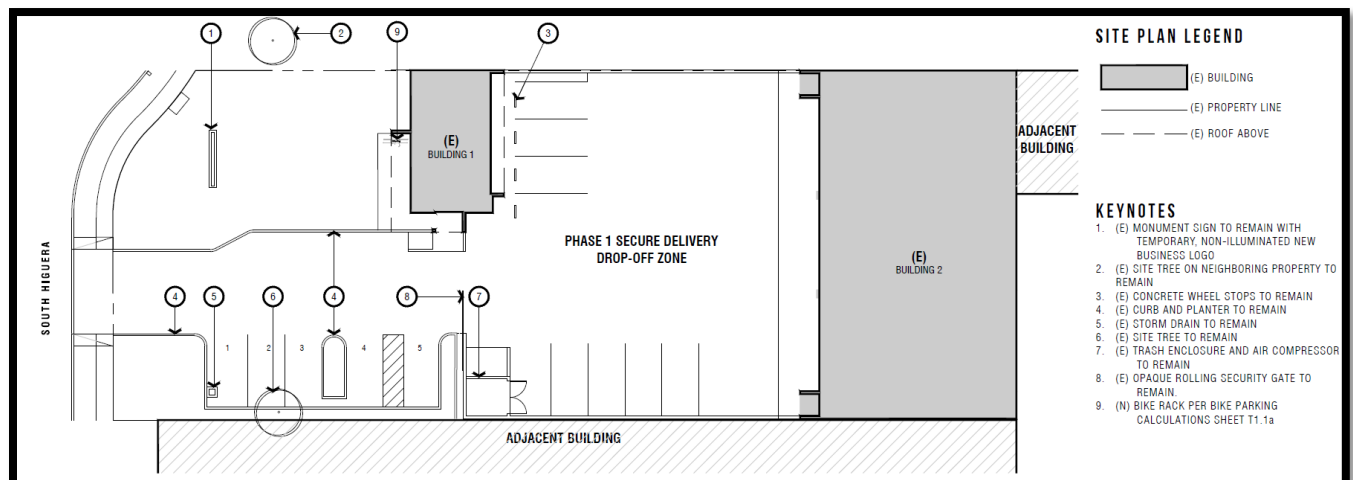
Phase One Site Plan (Ten Over Studio 2021)
